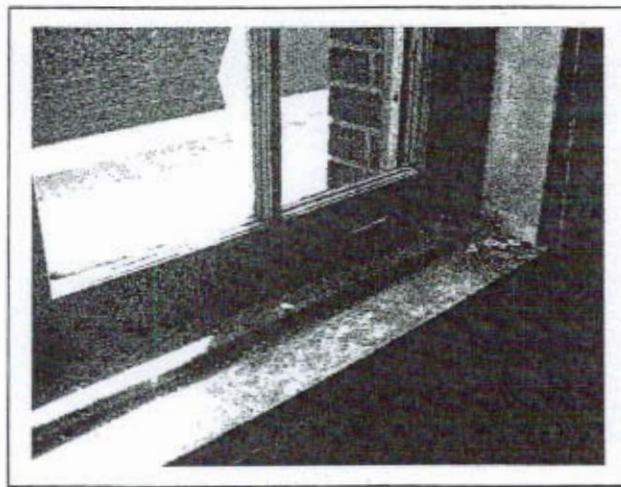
Viewing light gray window sash and sill, Throughout building
